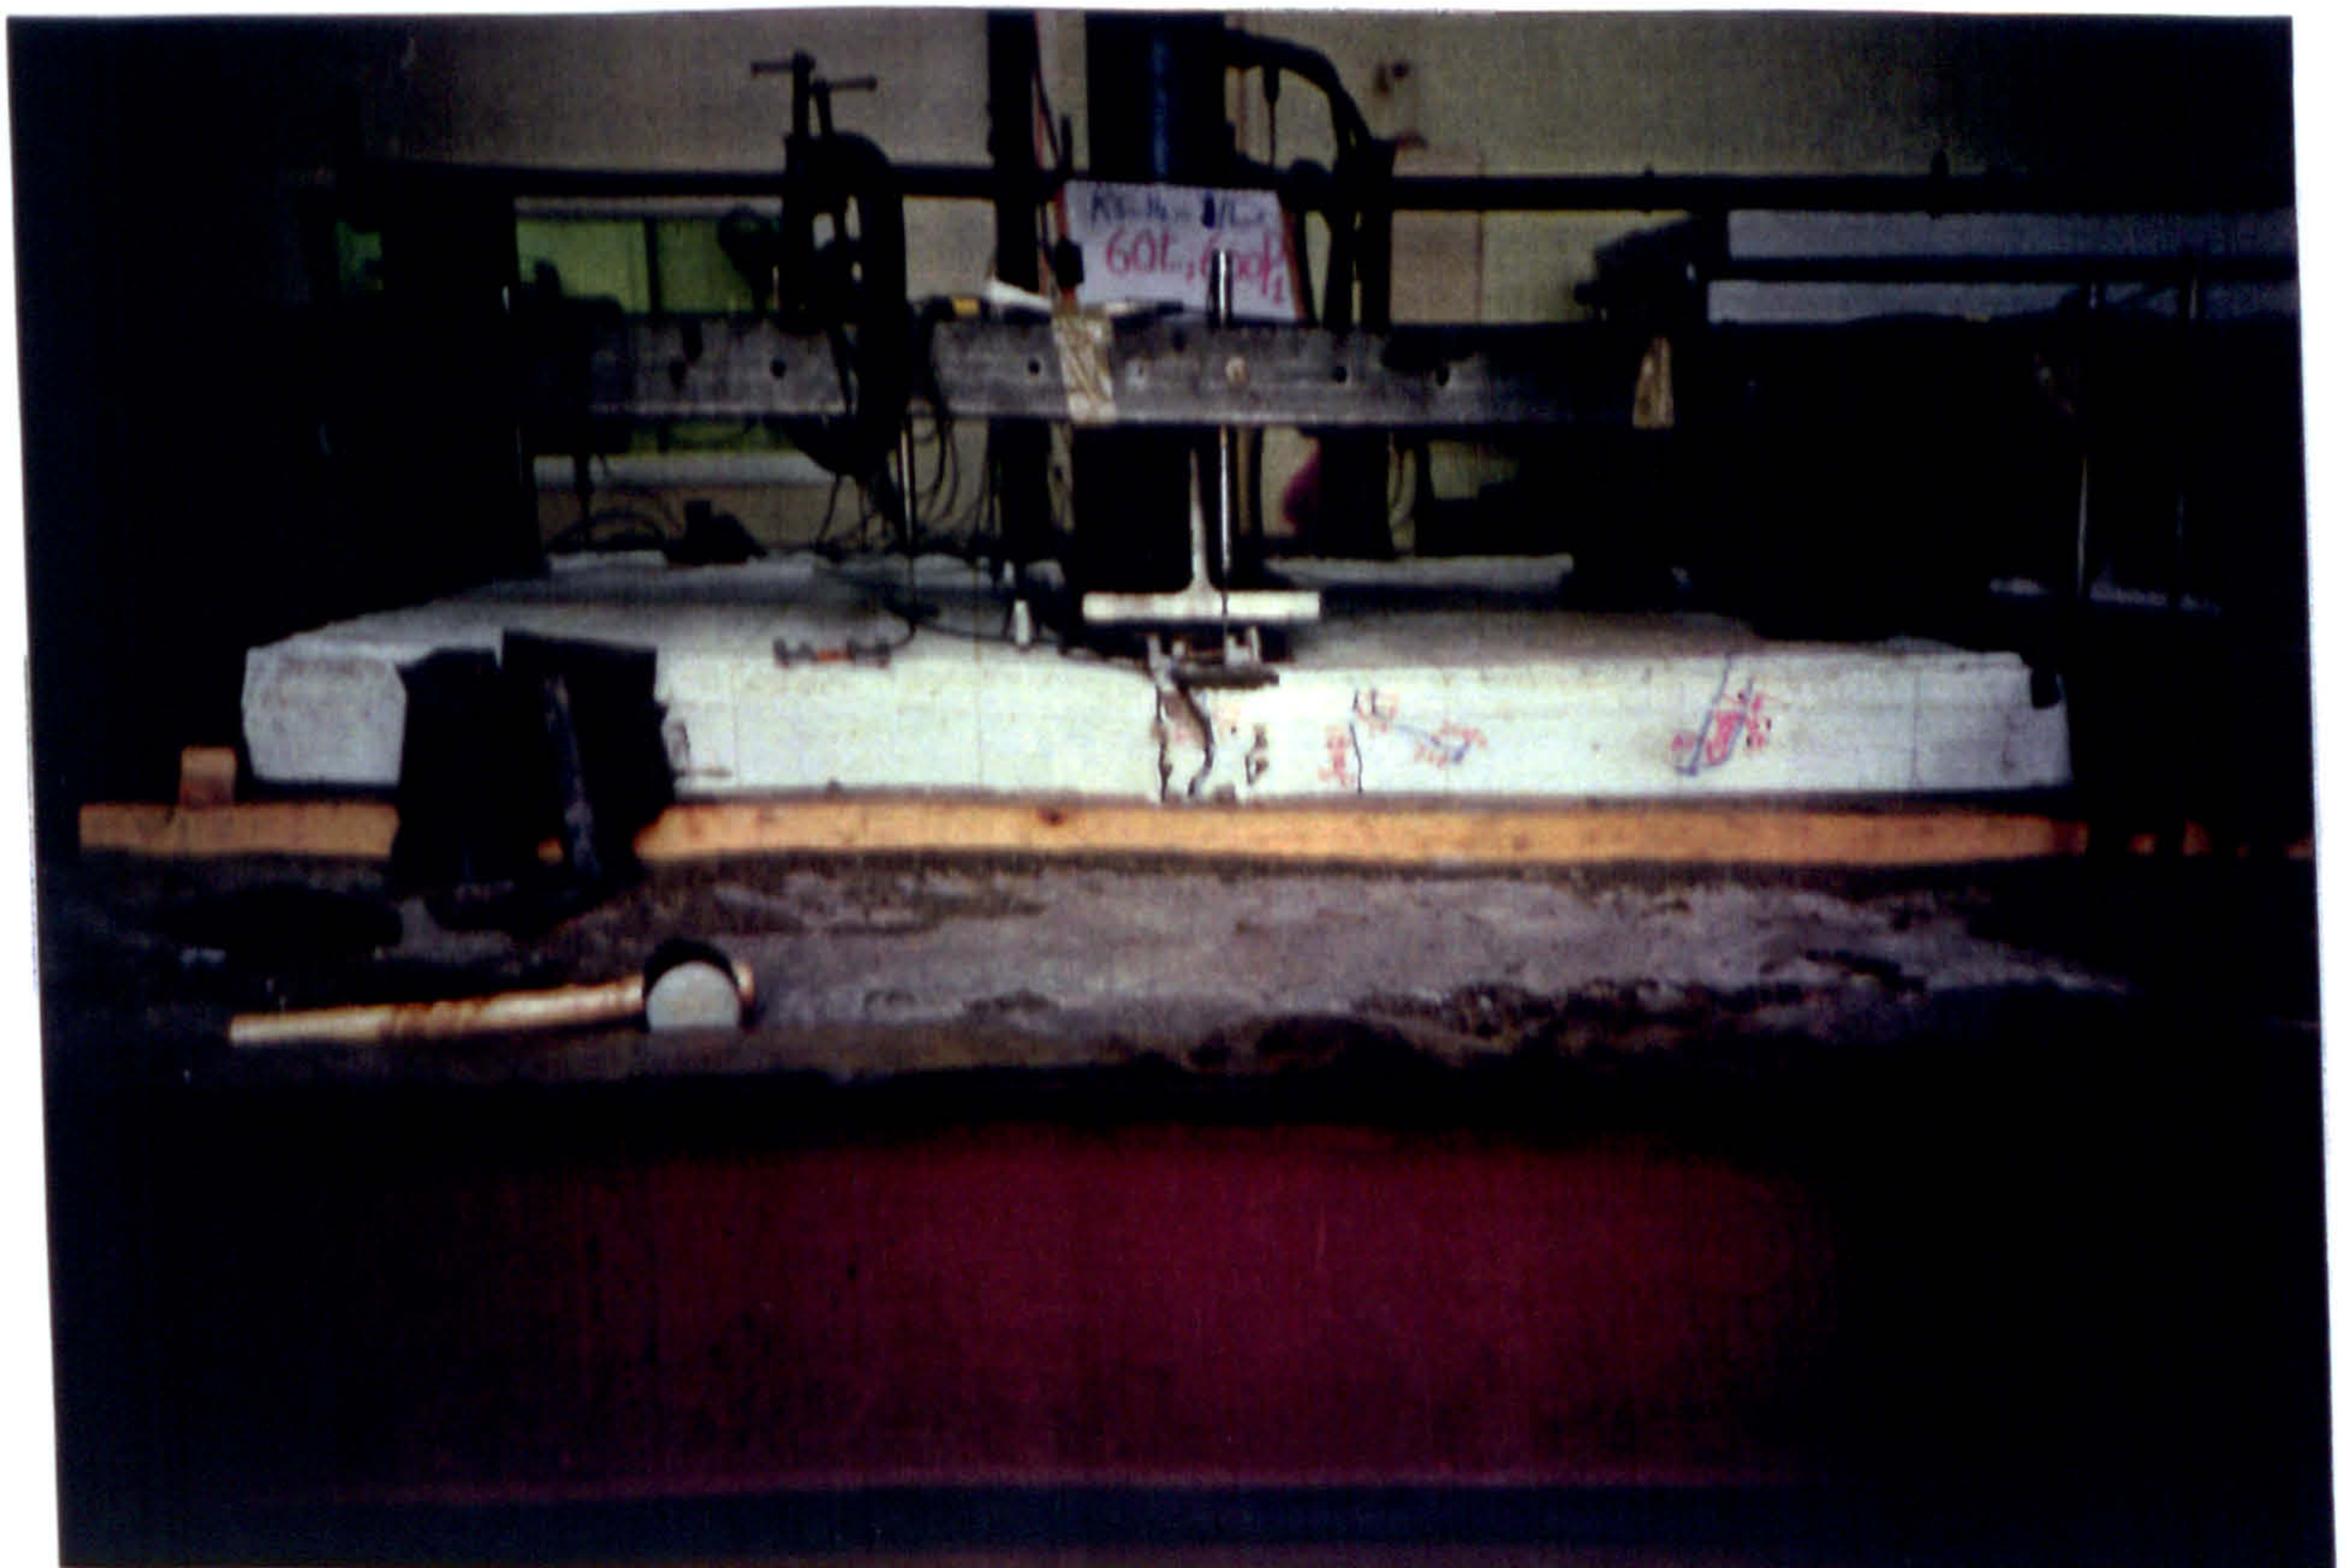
Fatigue Fracture Failure at P1 of Raft RS1 - Module M3
